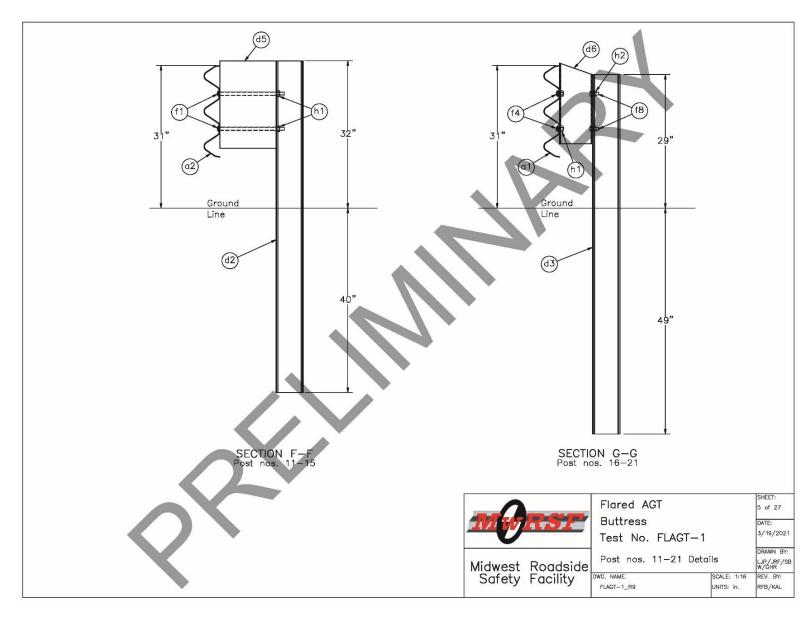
Post Nos. 11-21 Details, Test No. FLAGT-1
